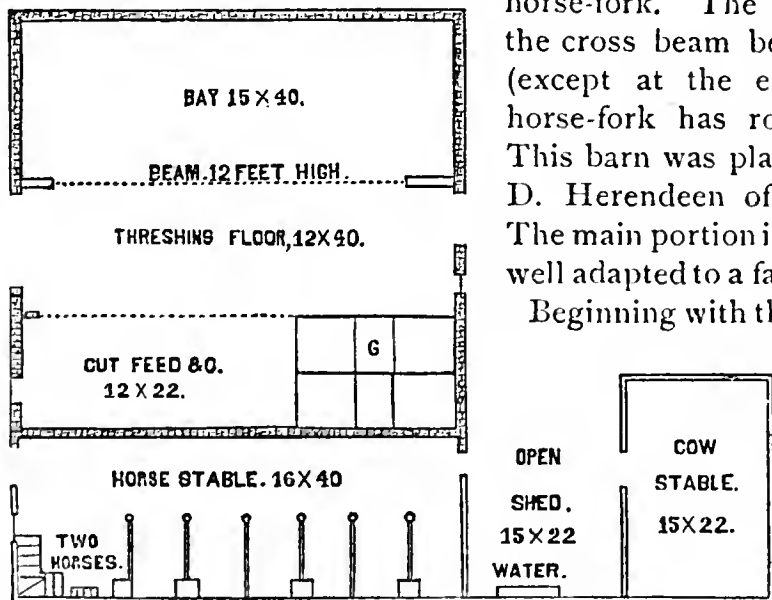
Plan of Barn—Horse Stalls 16 inches below Barn Floor, 8 feet high in the clear.
